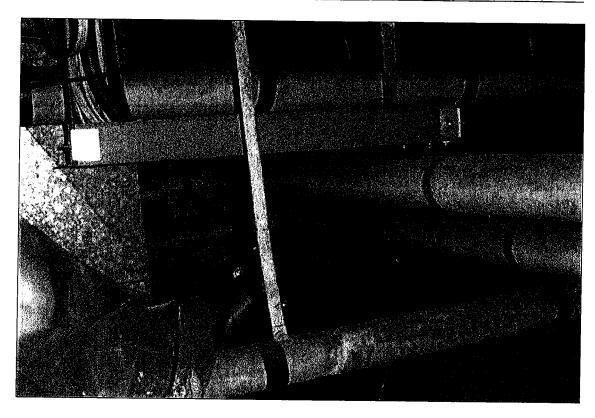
Exposed Asbestos to Pipe in Plant Room
